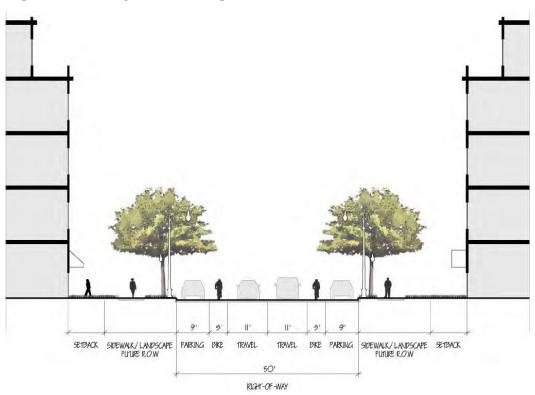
Bay Road, Pulgas Avenue to Tara Road
